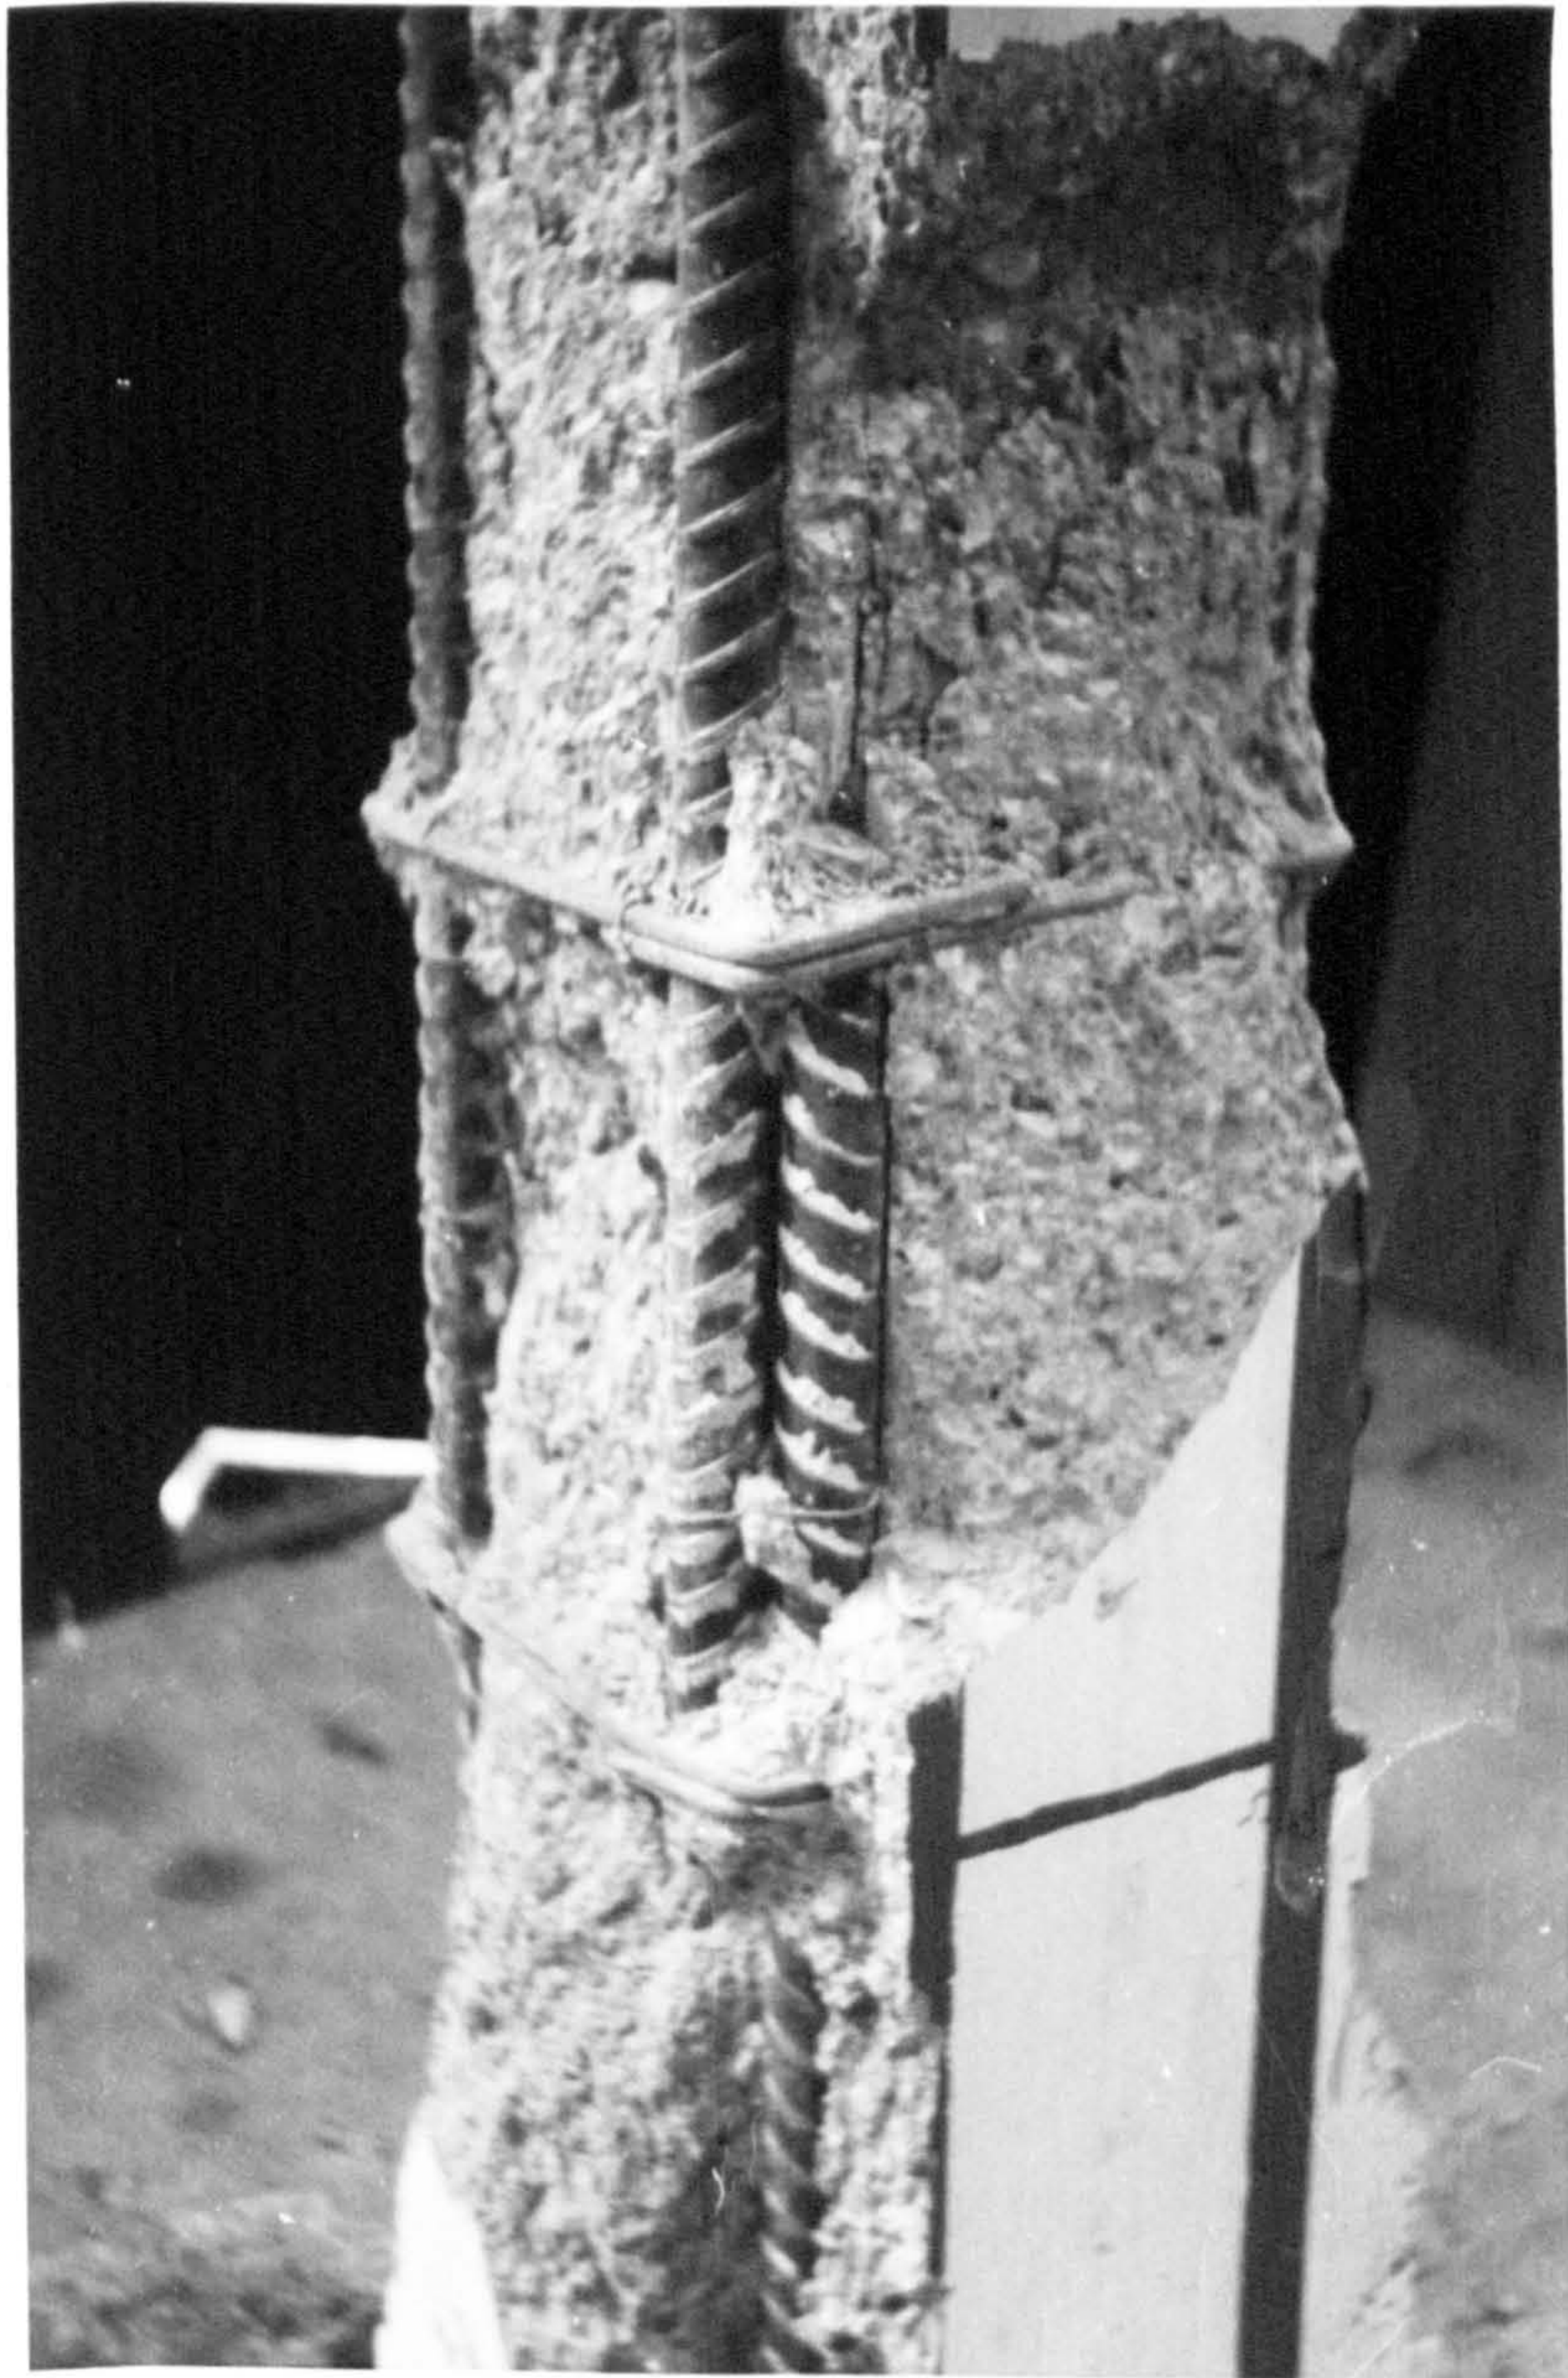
Typical failure of lapped joint, showing wedges of concrete adhering to ribs.
